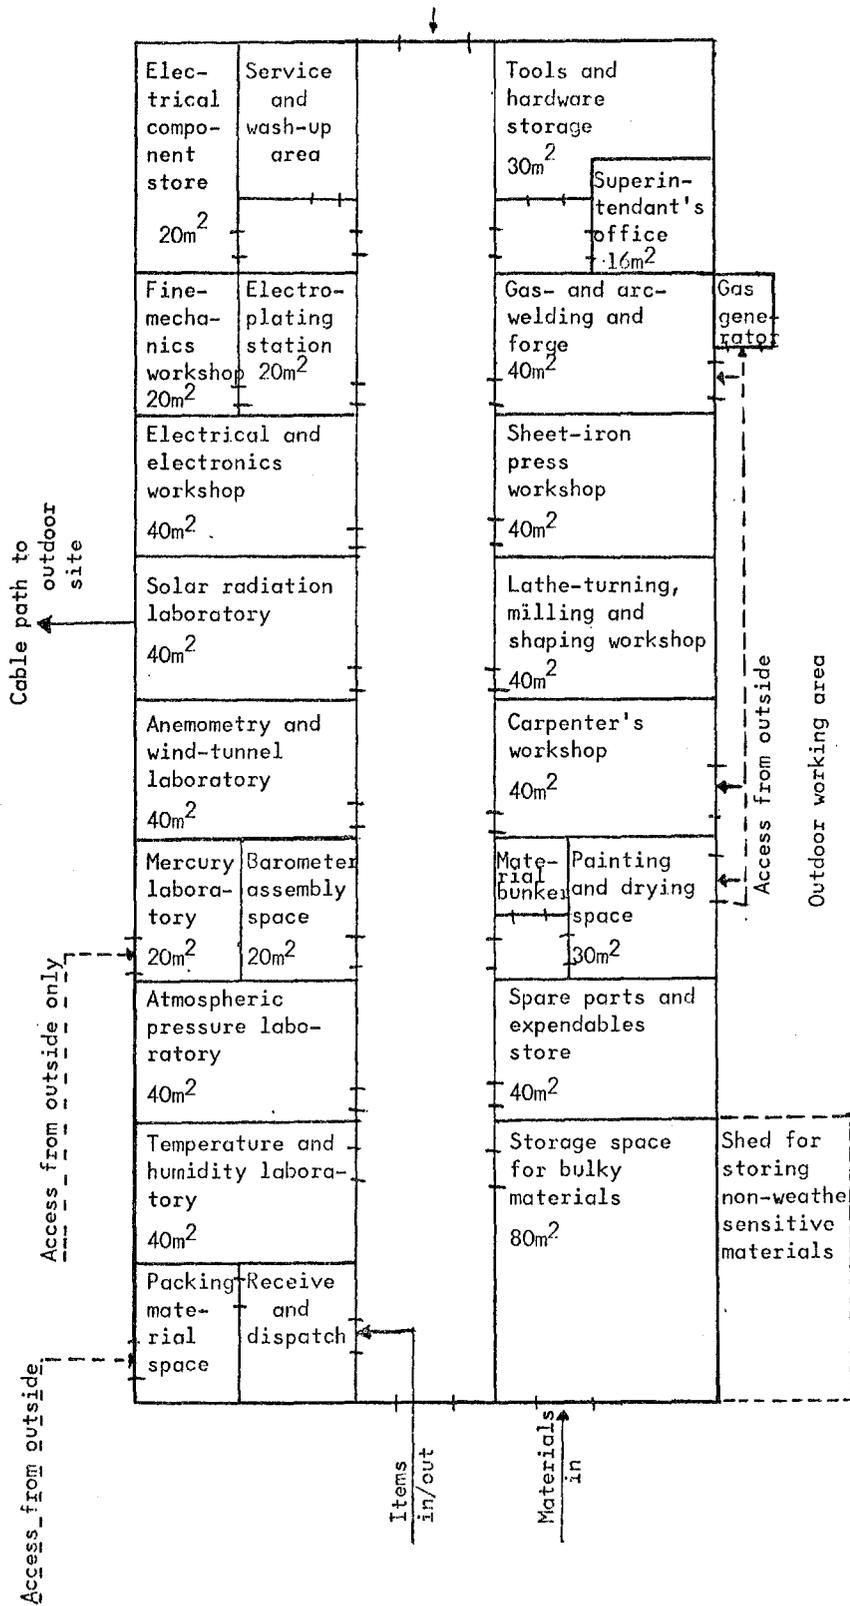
Example of workshop and laboratory layout (drawing not to scale)
